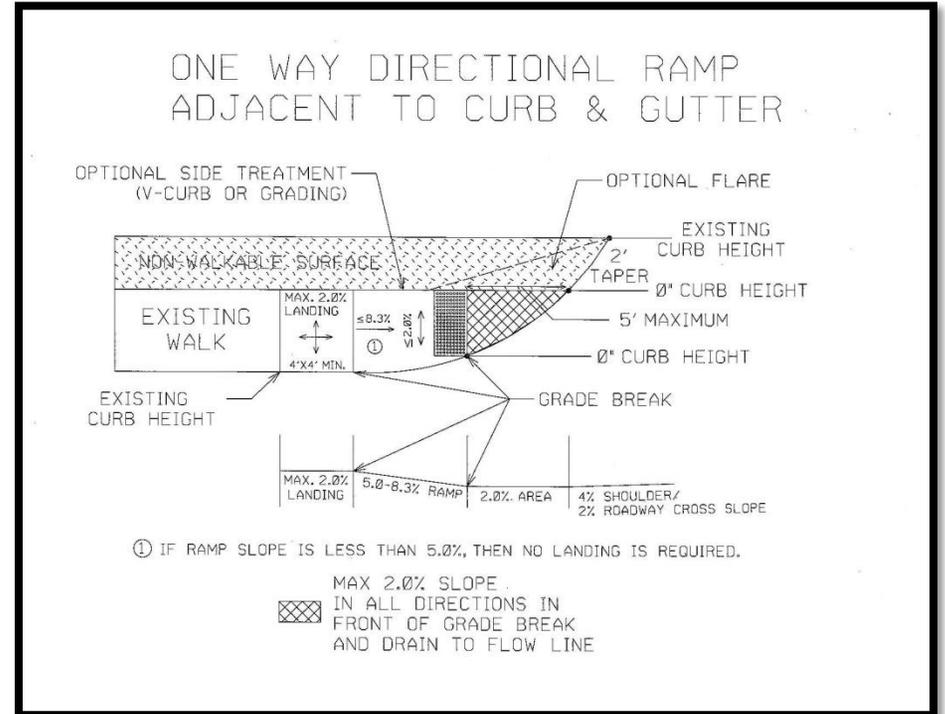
One Way Directional Ramp Adjacent to Curb and Gutter
